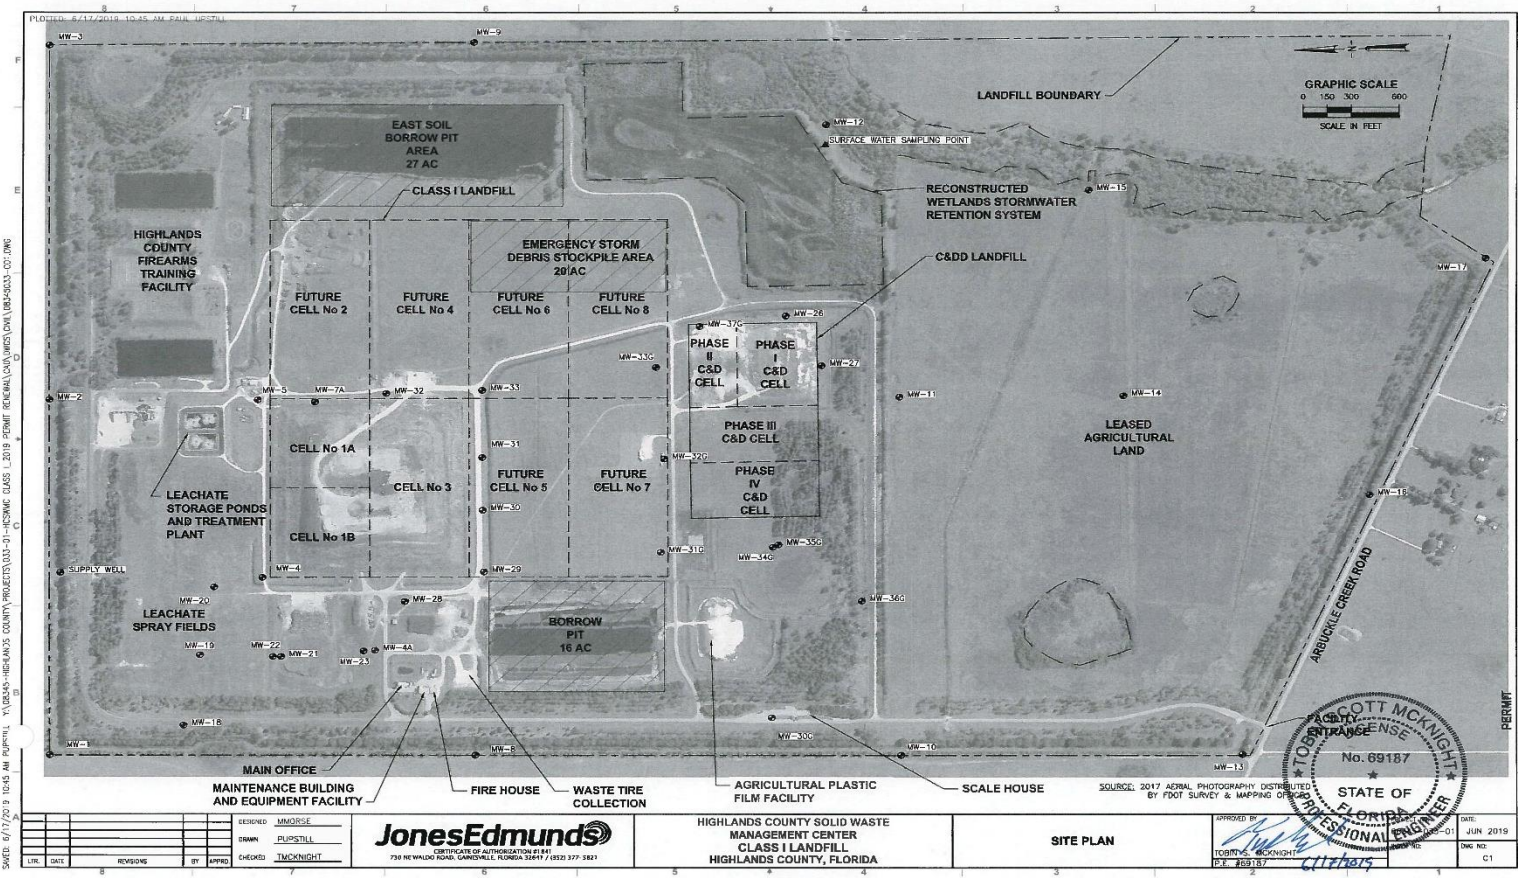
Site Plan and Groundwater Monitoring Well Locations, June 2019
